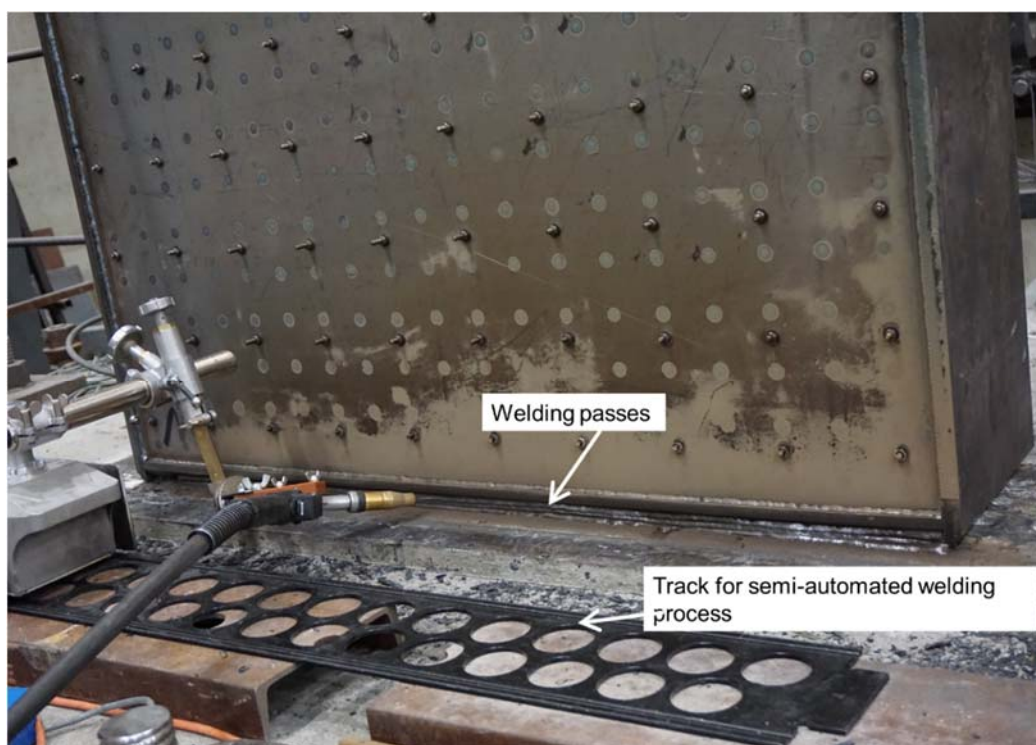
SC-W-H: Faceplate-to-baseplate welding in progress
